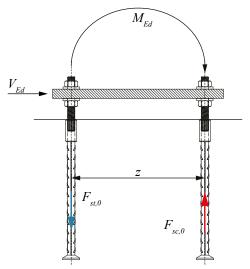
Structural behavior of anchoring couplers in column-to-foundation connections.
